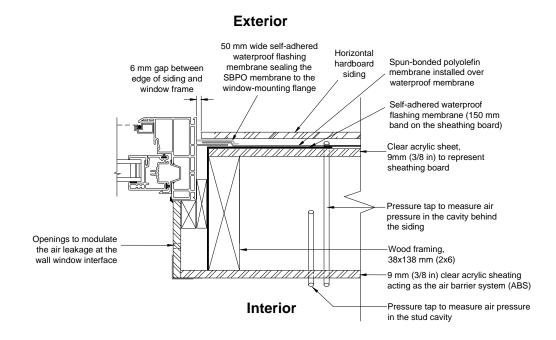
Modified Specimen – B-side (identical to original horizontal section)
